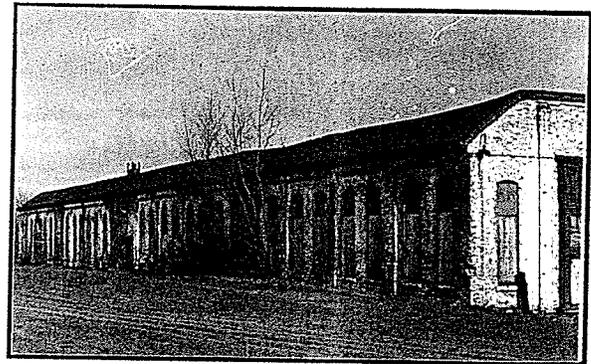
View of B&B Building, 1993. Note the structural deformation of the roofline and walls.
